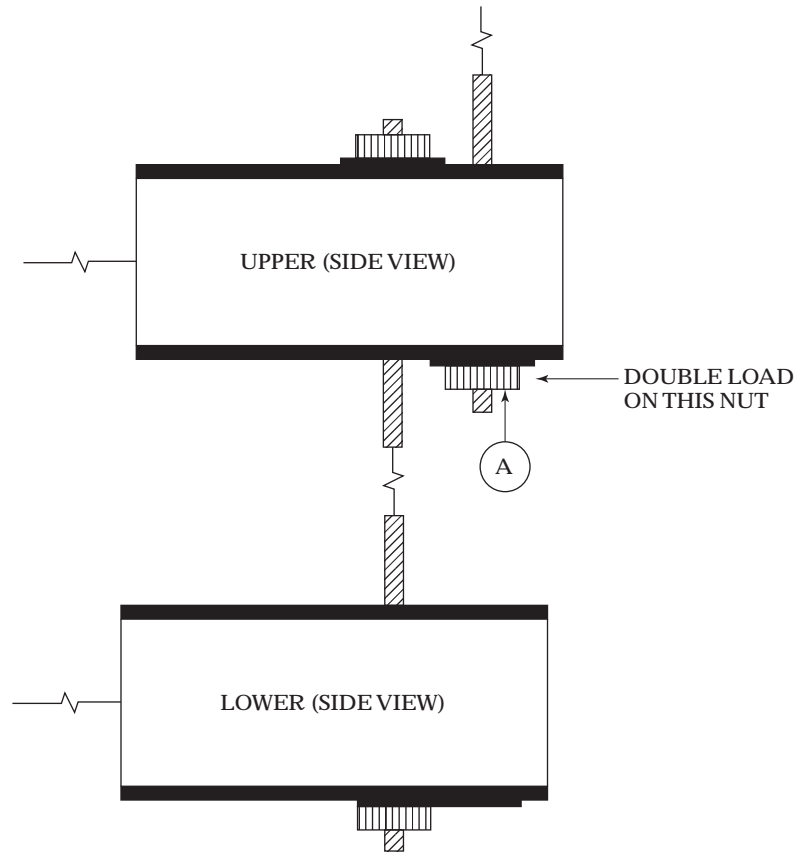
Kansas City Hyatt walkway support structure as actually built.
